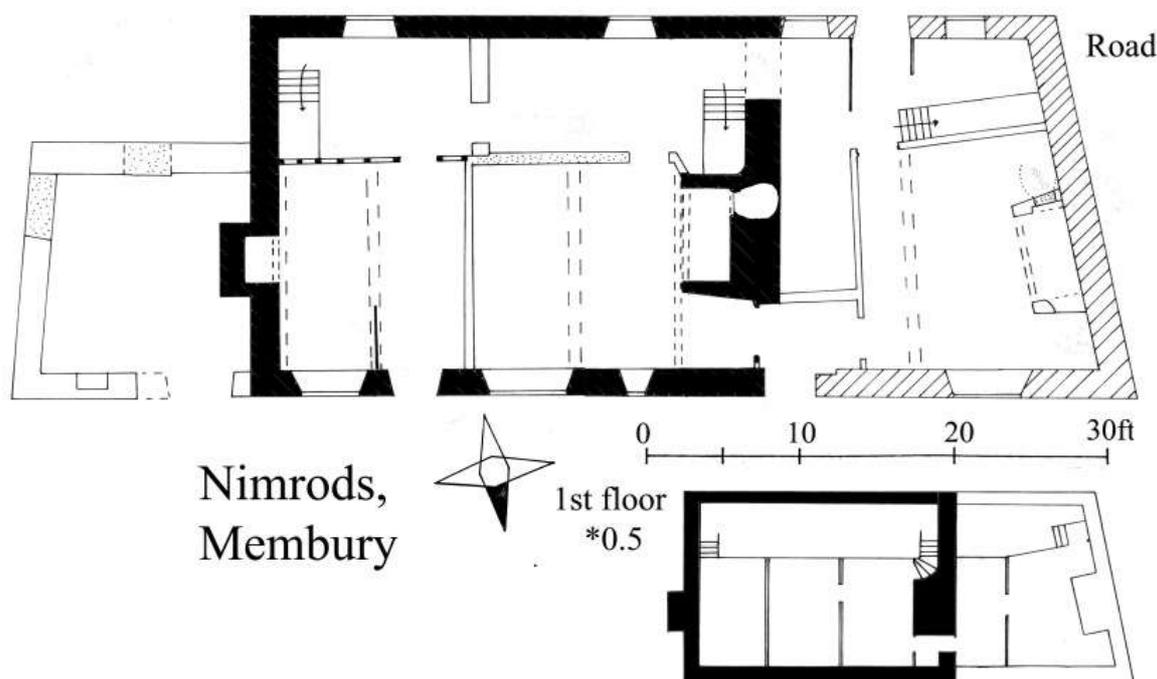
Nimrods, Membury: ground floor plan and outline first-floor plan.
